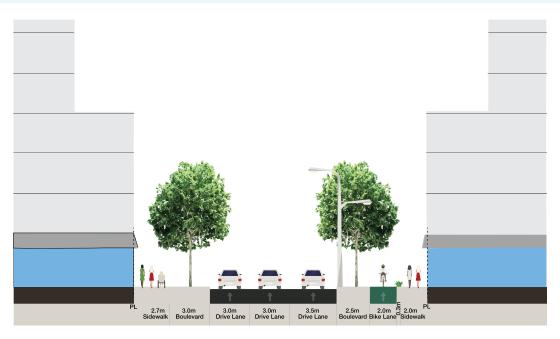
Conceptual cross section for Vernon Avenue (22 metres)
